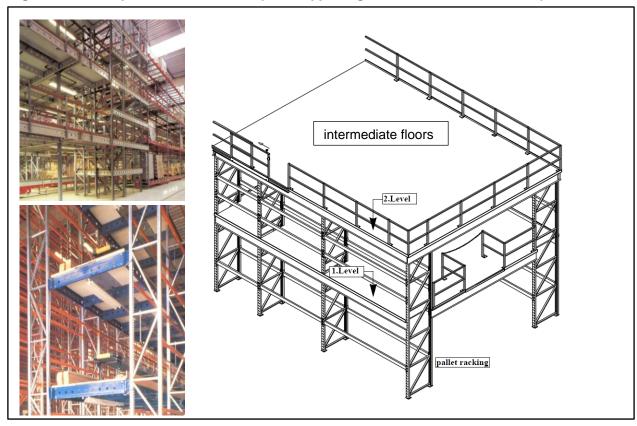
Examples of constructions (PRS supporting internal intermediate floors)
